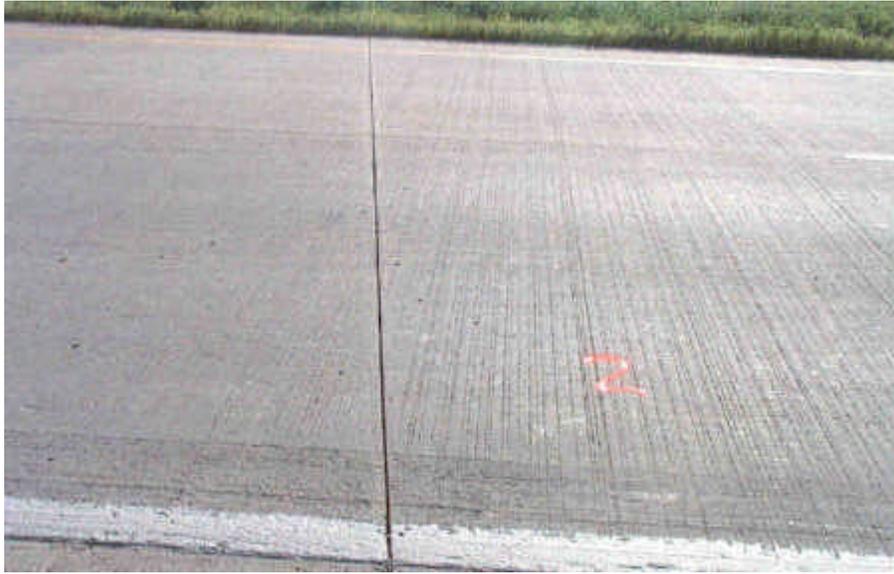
Tining in Test Section 2 at Station 8930+00
